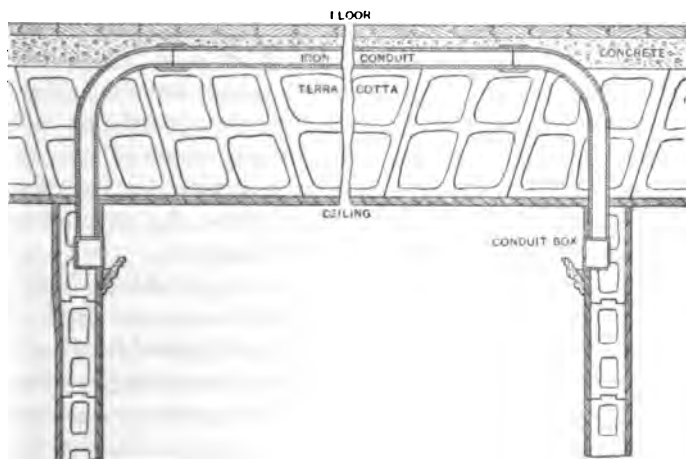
METHOD OF PLACING IRON CONDUIT ACROSS CEILING OF HALL.
